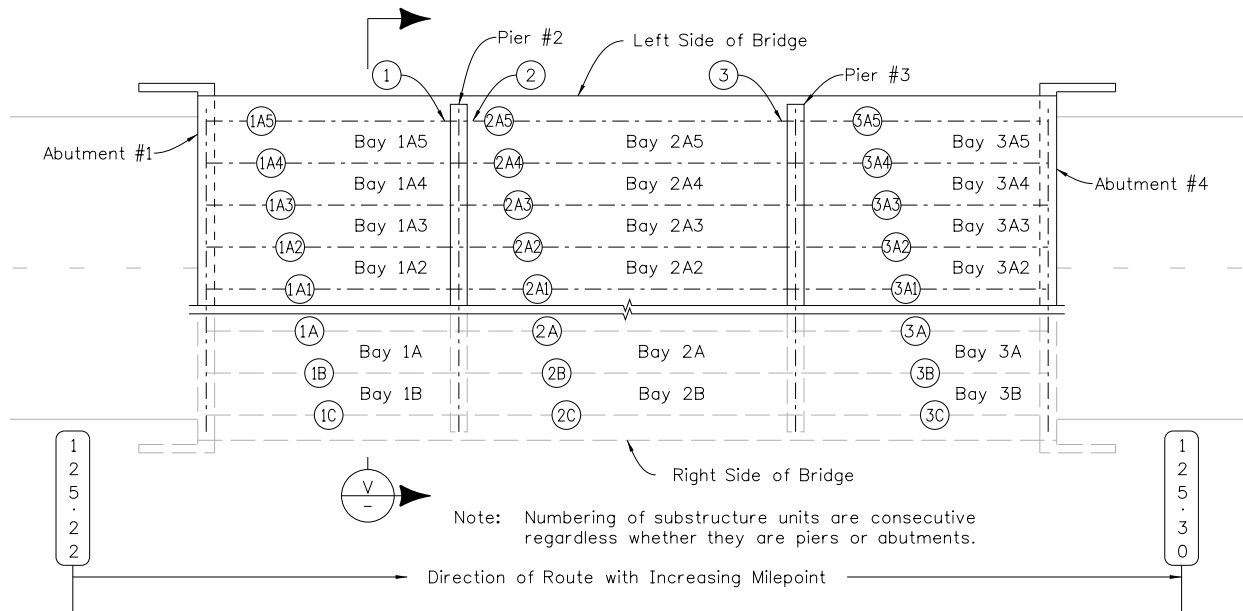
Structure Component Naming Convention for Left Widened Bridges
